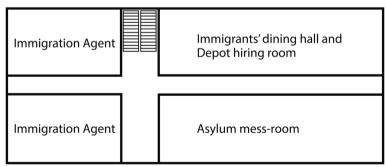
Plan of Hyde Park Barracks with likely room functions (P. Davies).
